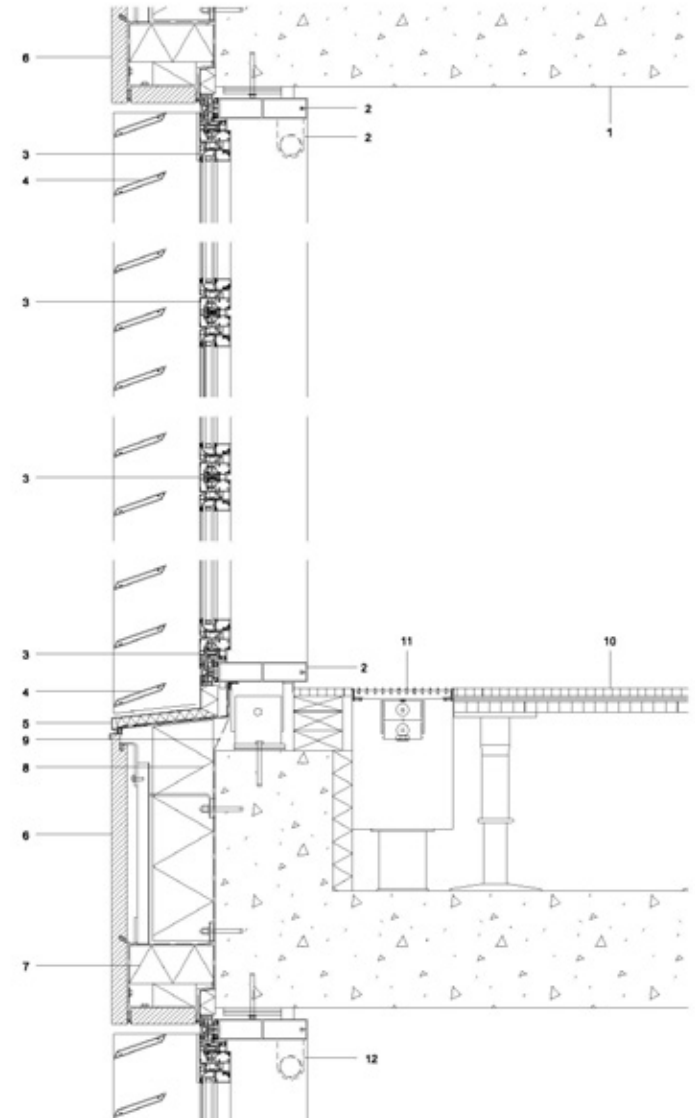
Carr Cotter & Naessens Architect's detailed elevation through the Haigh Terrace elevation
